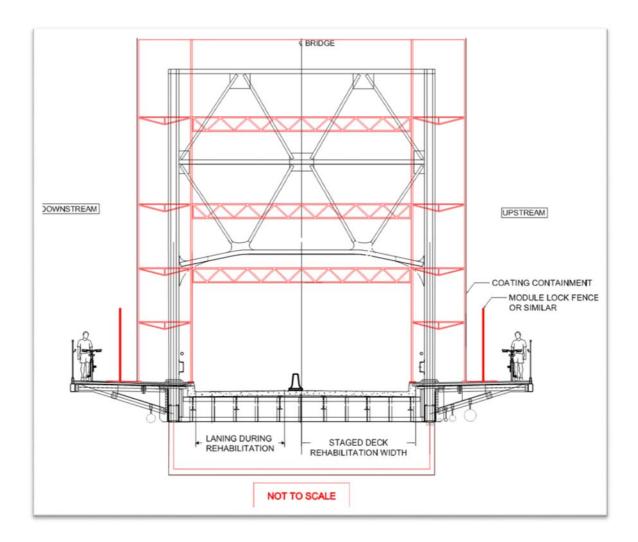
SAMPLE BRIDGE CROSS-SECTION DURING REHABILITATION WITH PEDESTRIANS AND CYCLISTS ACCOMMODATED ON NEW WIDENED WALKWAYS
